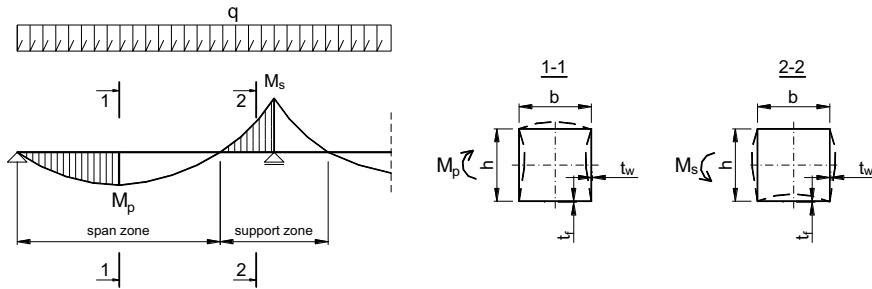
Static model of the end span of continuous beam with thin-walled box section
